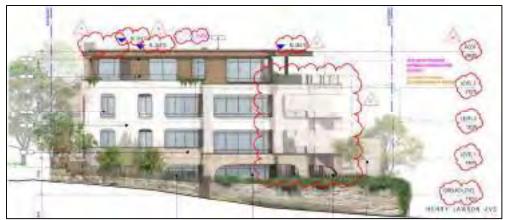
Extract of west elevation (Blues Point Road) showing LEP 8.5m height line (Source: Squillace Architecture, Project No. HIG2307, Sept 2024)
